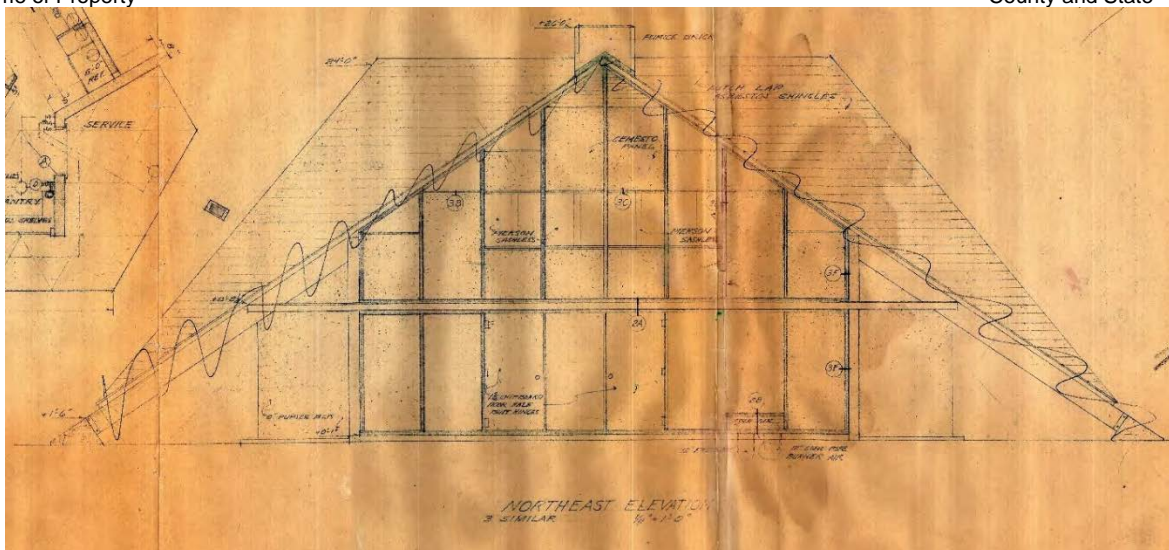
Northeast Elevation, depicting three-dimensional roof line, and northeast elevation.²¹ Small rectangular windows were added above the four middle boards during original construction, despite not appearing in the original blueprints.
